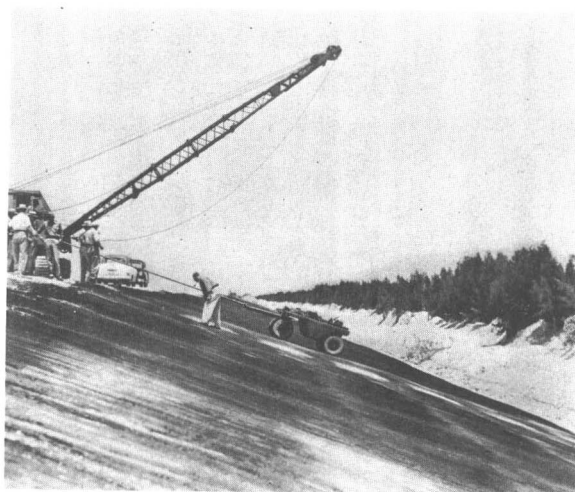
Compacting Revetment Pavement, Lake Okeechobee
